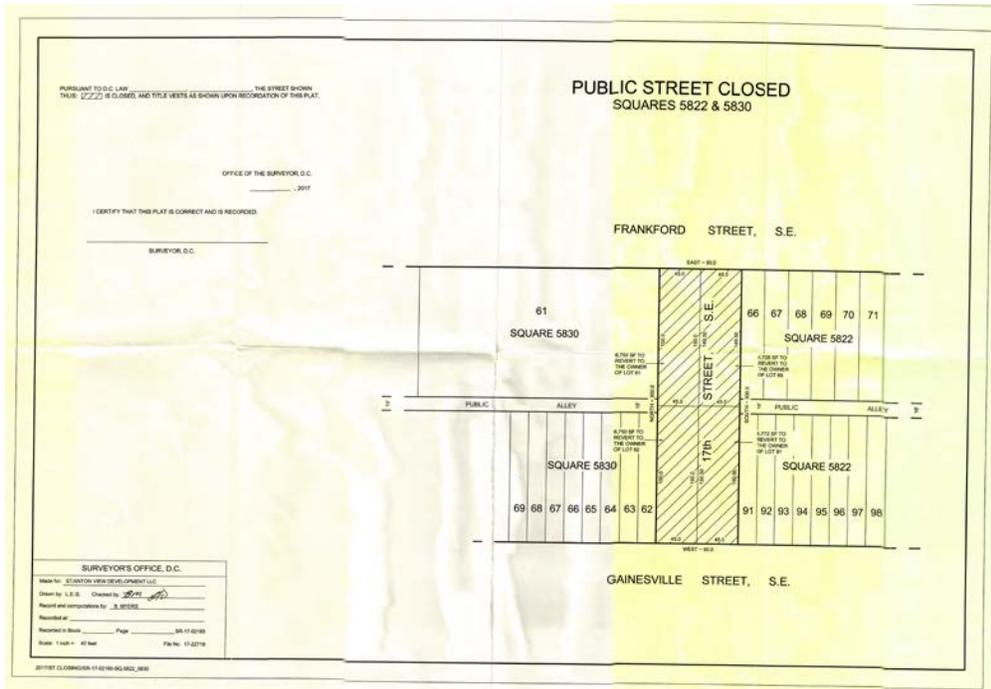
Proposed plat showing partial closing of 17th Street, SE.
